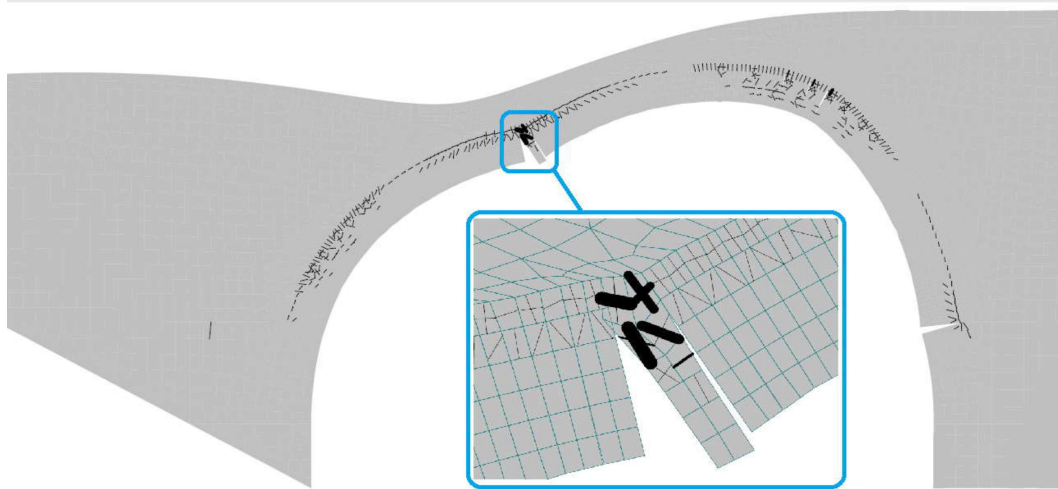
Deformed shape (Scale 1:10) and crack pattern under the load of to 1.67 MN
